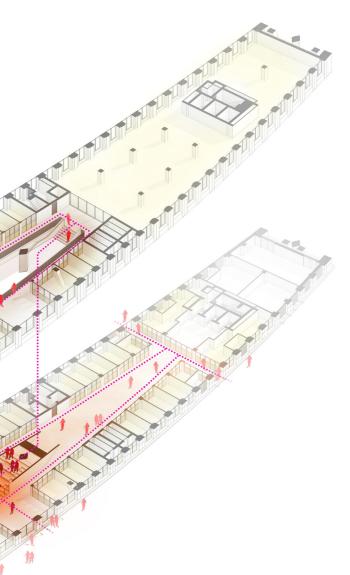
Publicly Accessible Open Space ground & first floor circulation axonometric diagram
